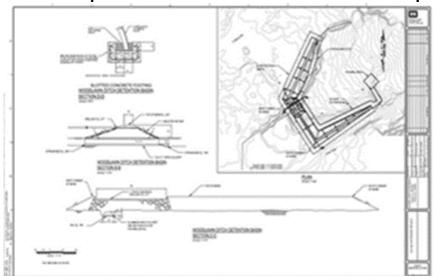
Sketch of Proposed Woodlawn Ditch Retention Basin Imposed on Site
